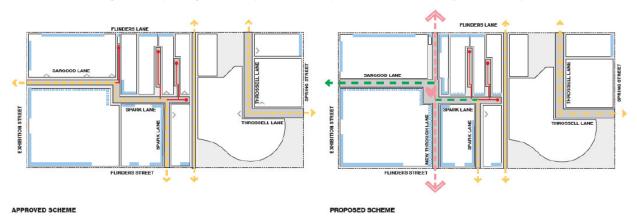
Approved and proposed surrounding laneway network (source: application plans by Bates Smart)
